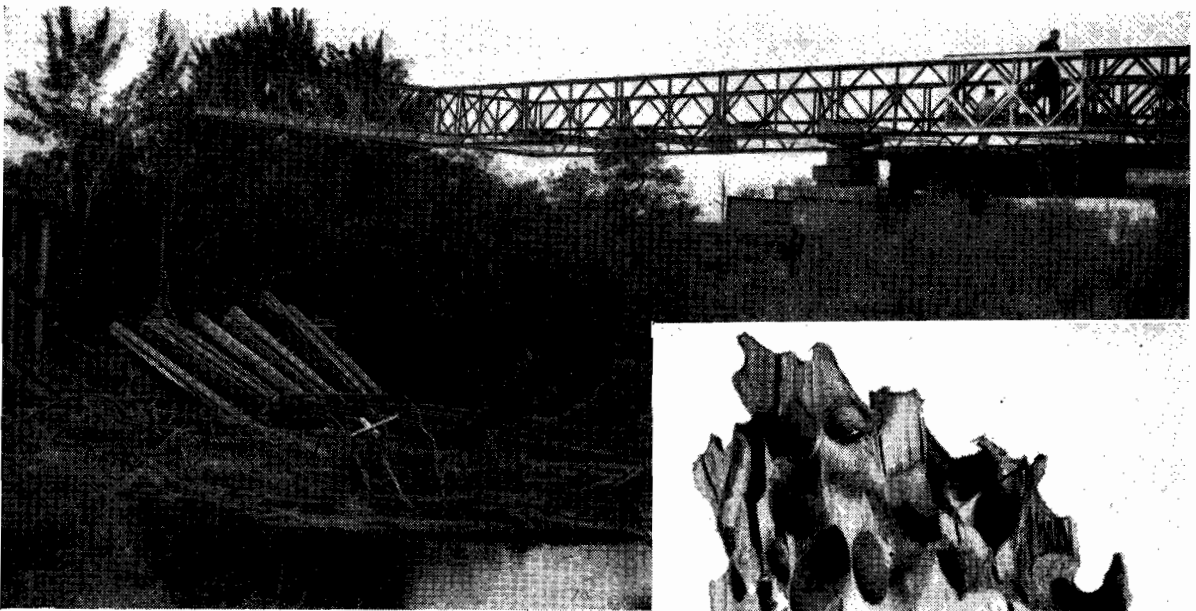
Bridge over Mitchell River at Wy Yung on the Bairnsdale-Bullumwall Road which collapsed on 27th January, 1956, owing to the presence of teredo in the piles.
